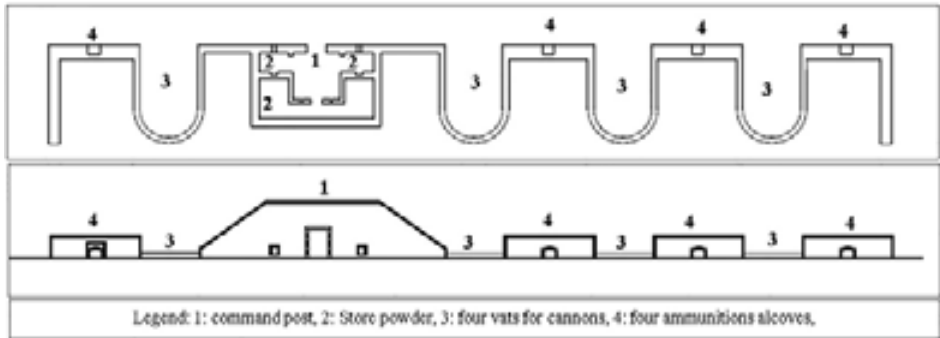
plan view and main façade of the center battery (Korichi, 2011).
